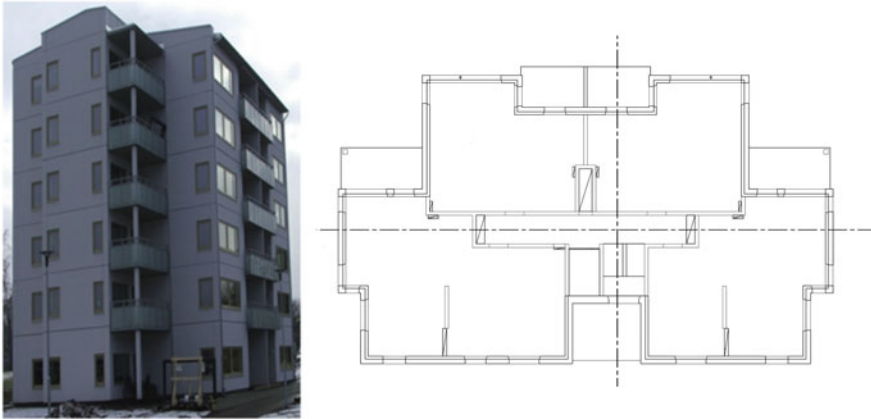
Photograph (left) and typical floor plan (right) of the modelled building
